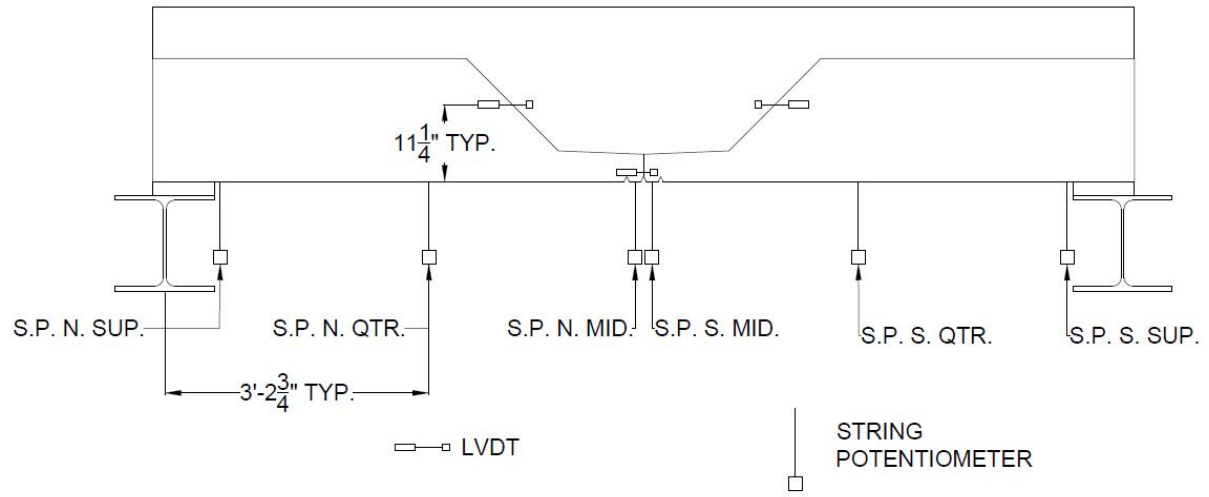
Elevation on inverted T-beam subassembly specimen, showing arrangement and naming convention for string pots
